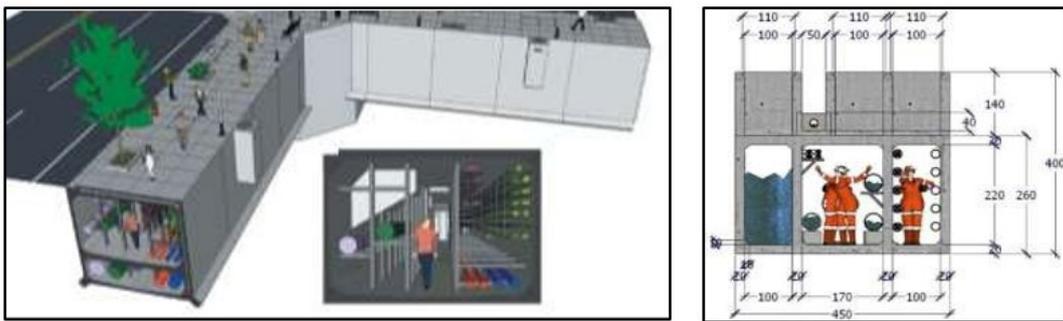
Cross Section of the Multi-Utility Tunnel (a); Type 1 Multi-Utility Tunnel (b).
